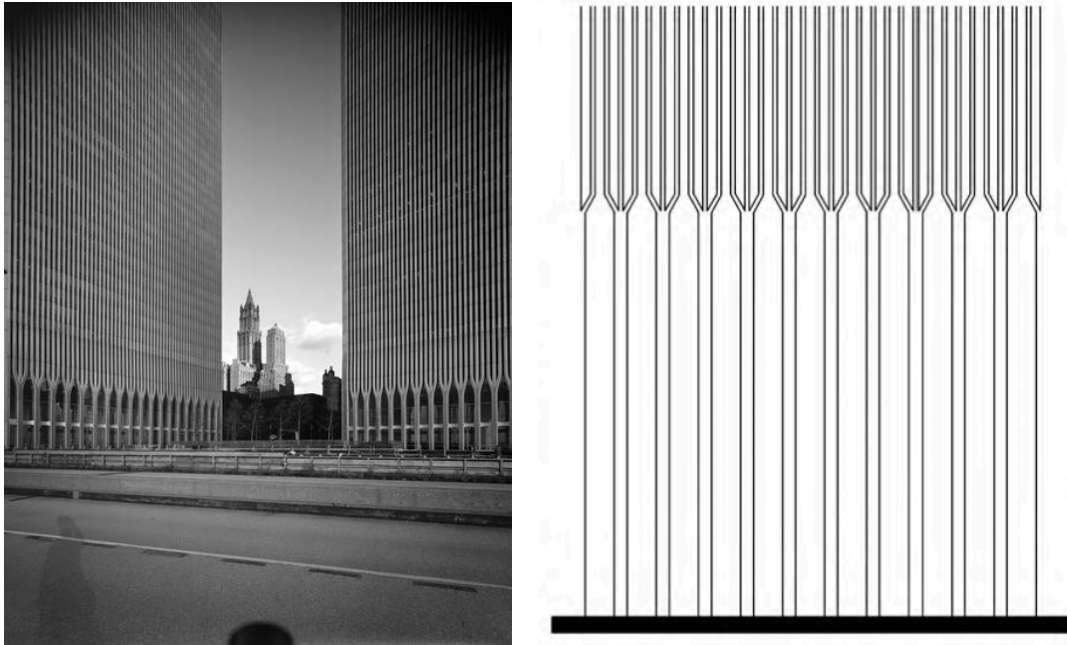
World trade Center, New York City (on the left); detail of the branched columns (on the right)
